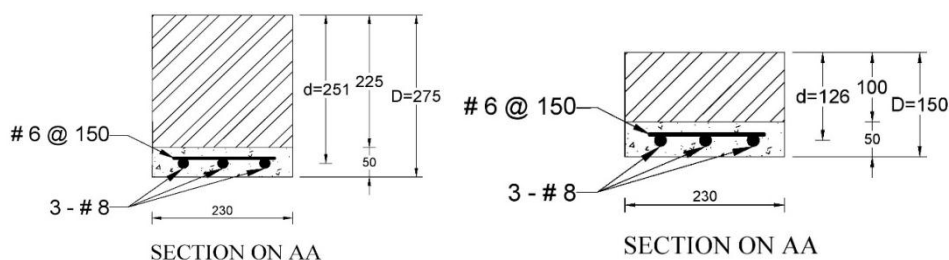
Typical Cross Sections - TRBWCL1- 1 layer BW & TRBWCL2 – 3 Layers BW
